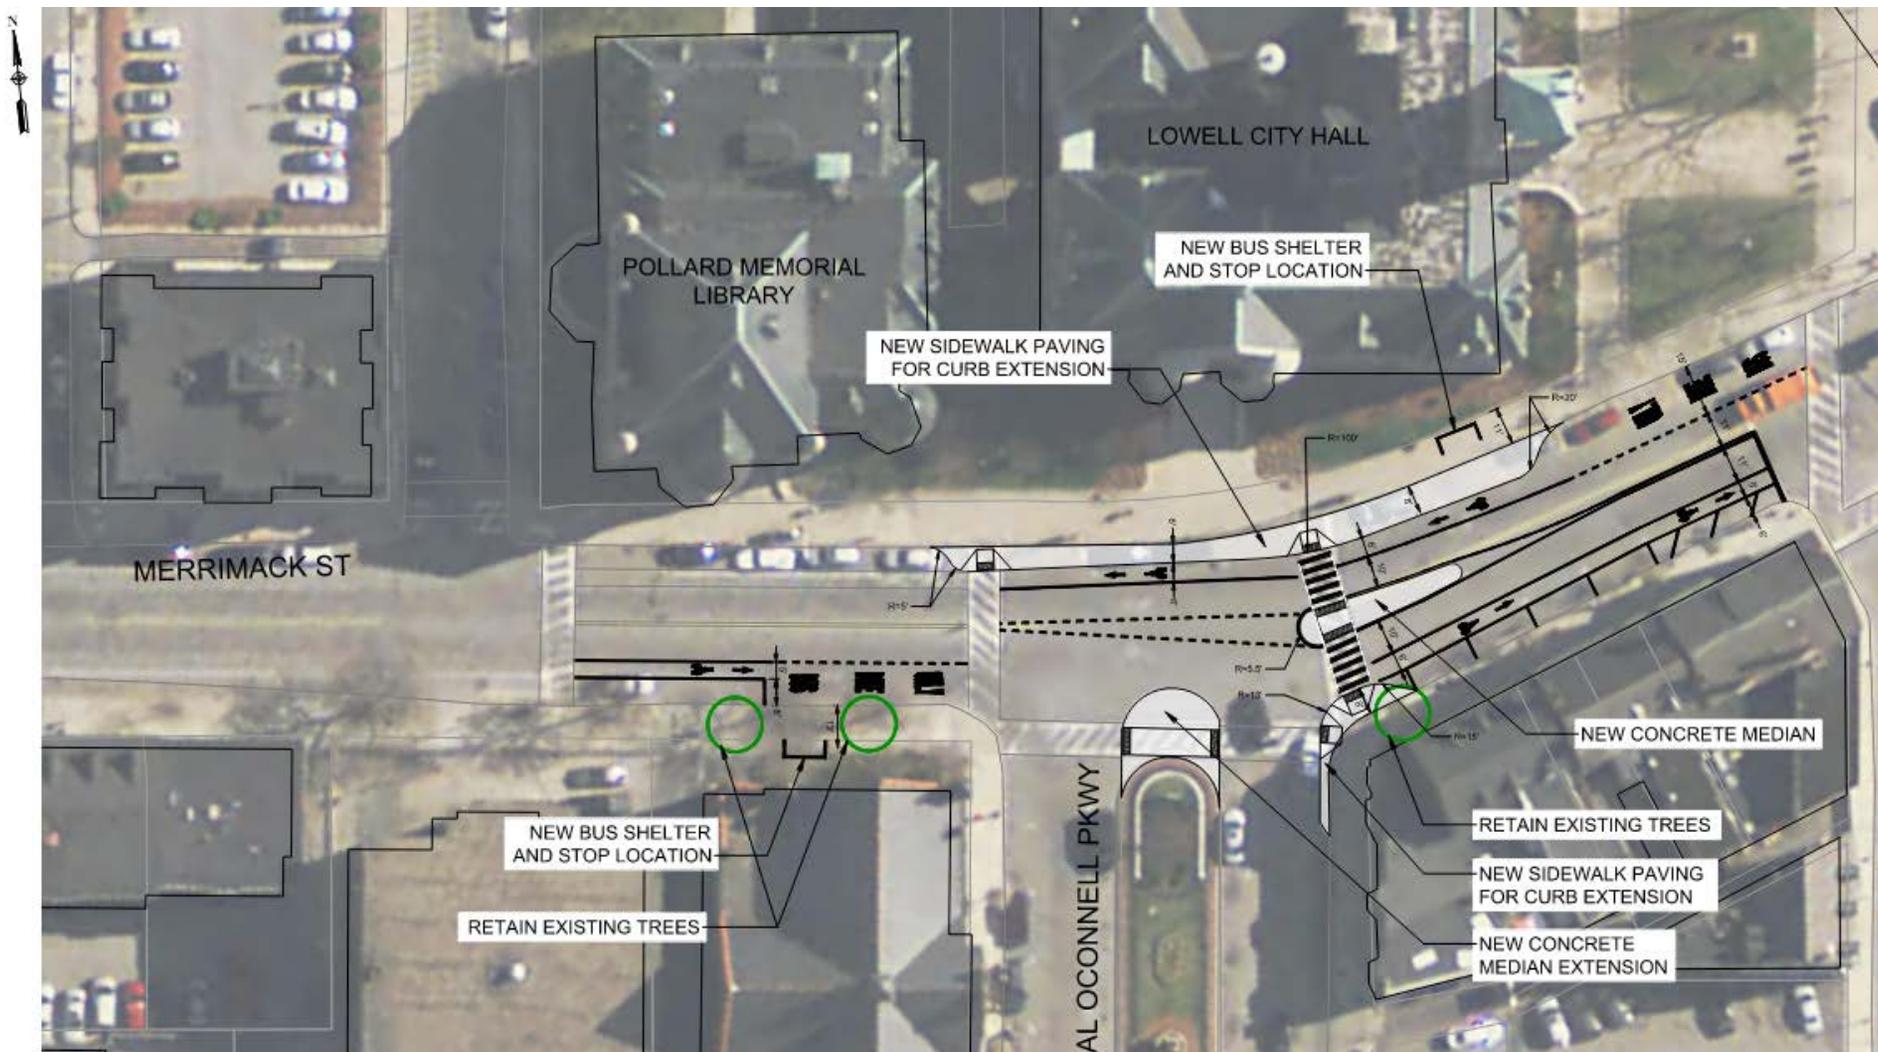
Bus Stop and Intersection Concept Plan for Merrimack Street at City Hall
